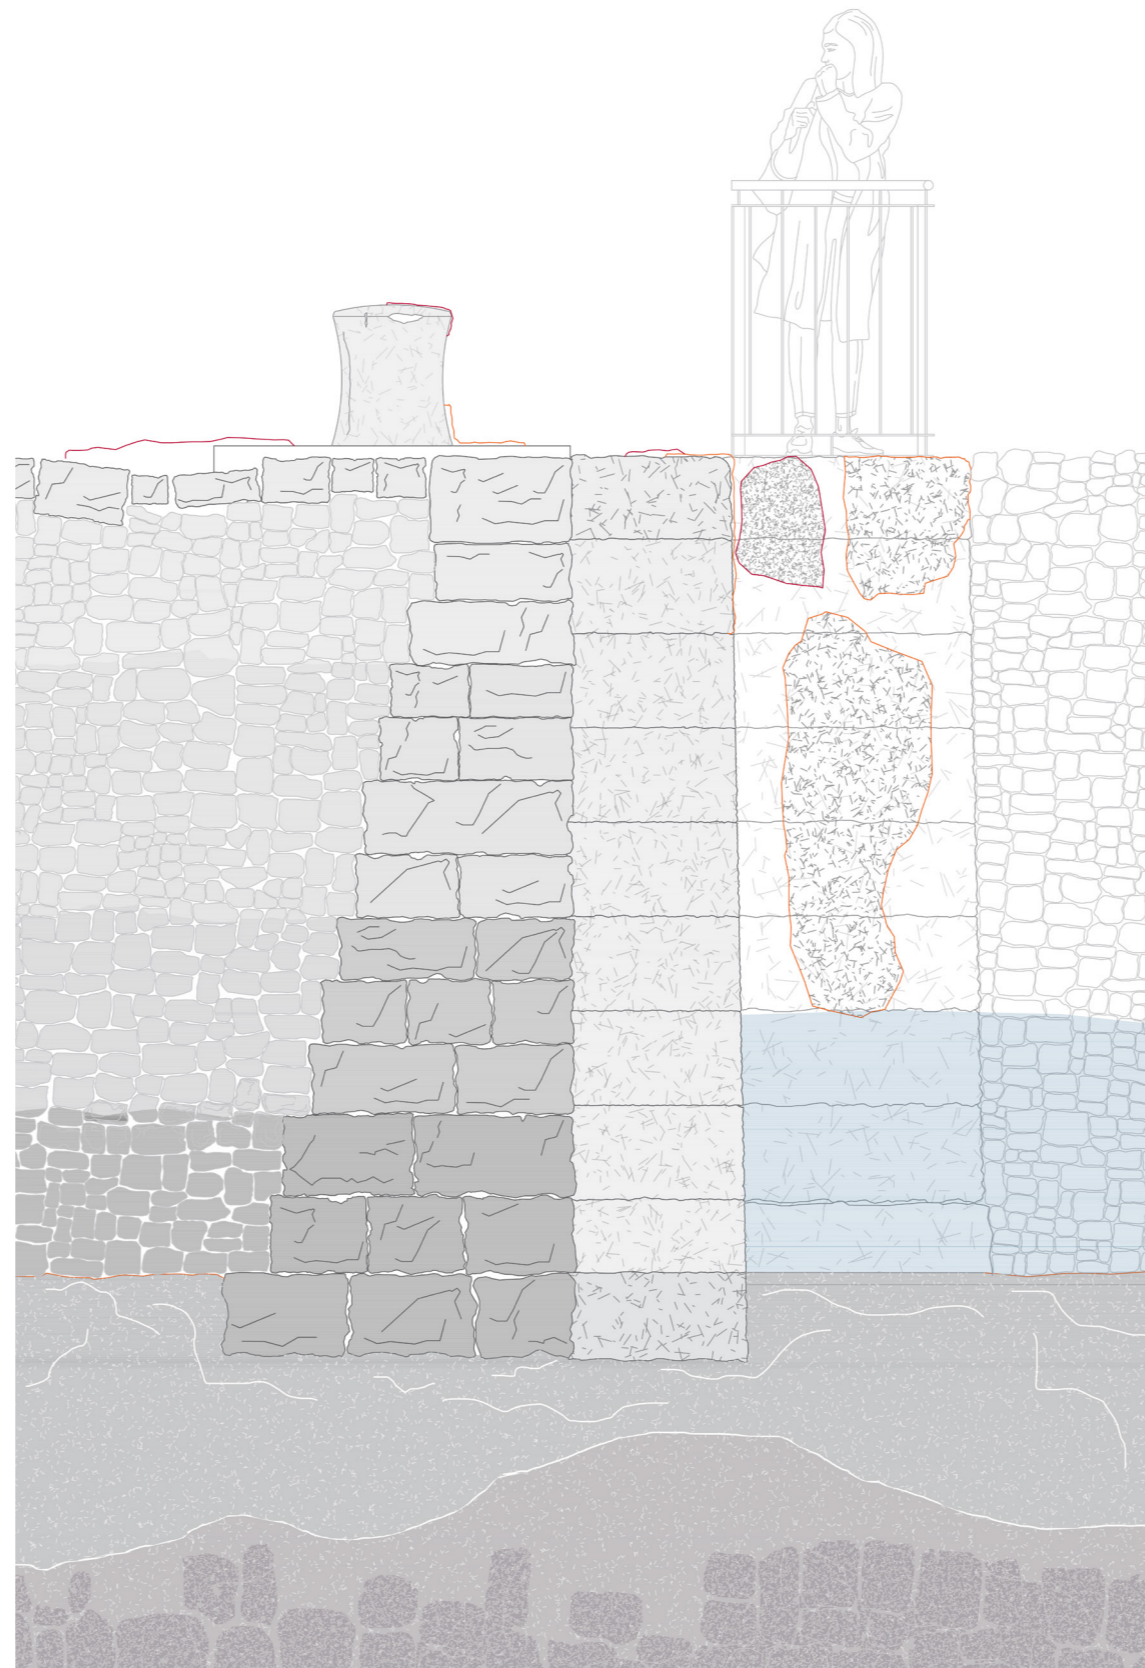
, Author, "Detail of Mulranny Pier Low Wall", Drawing, 2022
